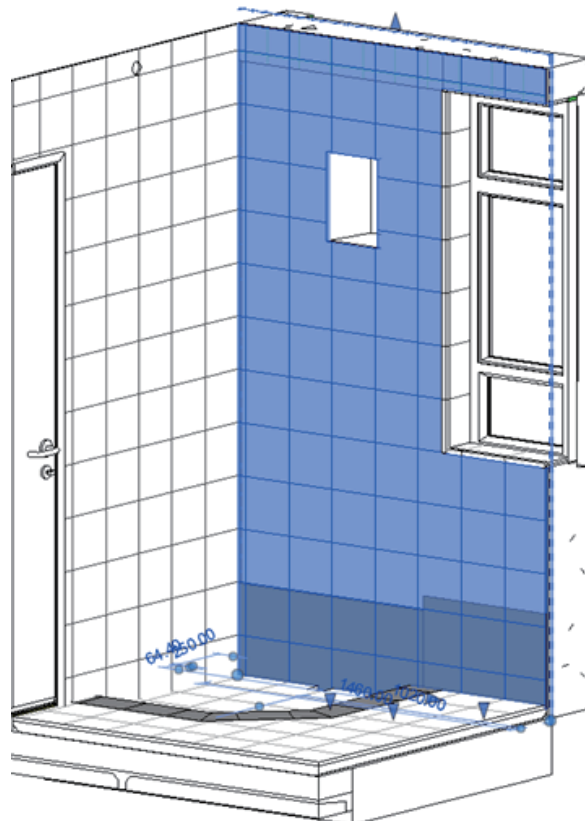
3D View of Bathroom modelled with Wall Finishes
